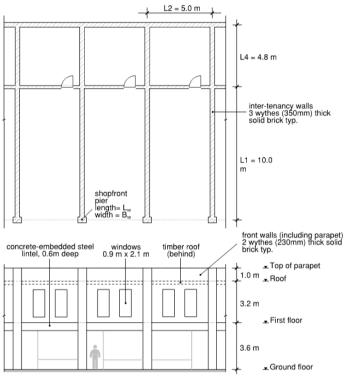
An example unreinforced masonry building generally representative of "Type D" New Zealand unreinforced masonry buildings with open fronts.
